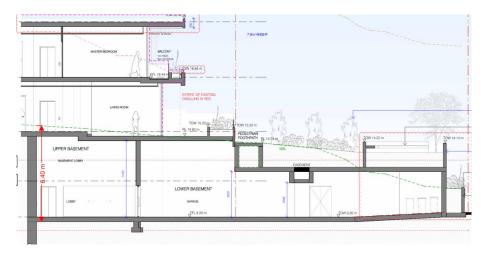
Proposed front long section with Council markings showing the extent of the proposed earthworks
